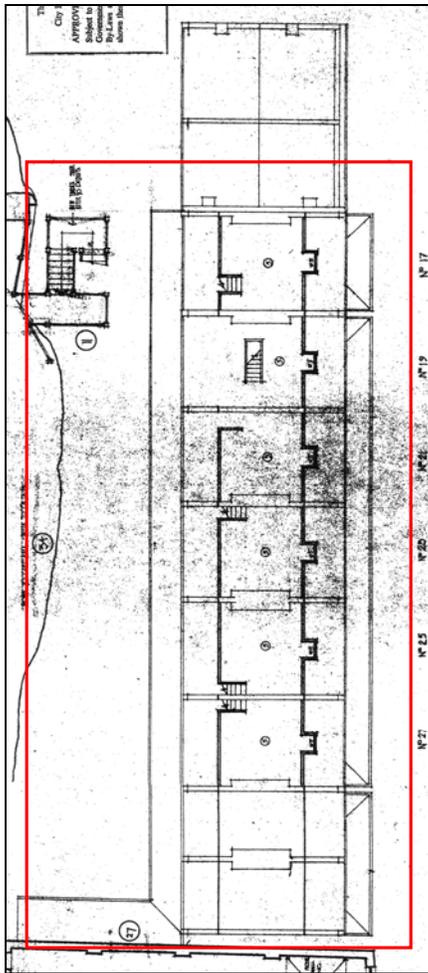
Amended drawings prepared by Fisher Jackson Hudson Architects in 1972. Attic Plan.
